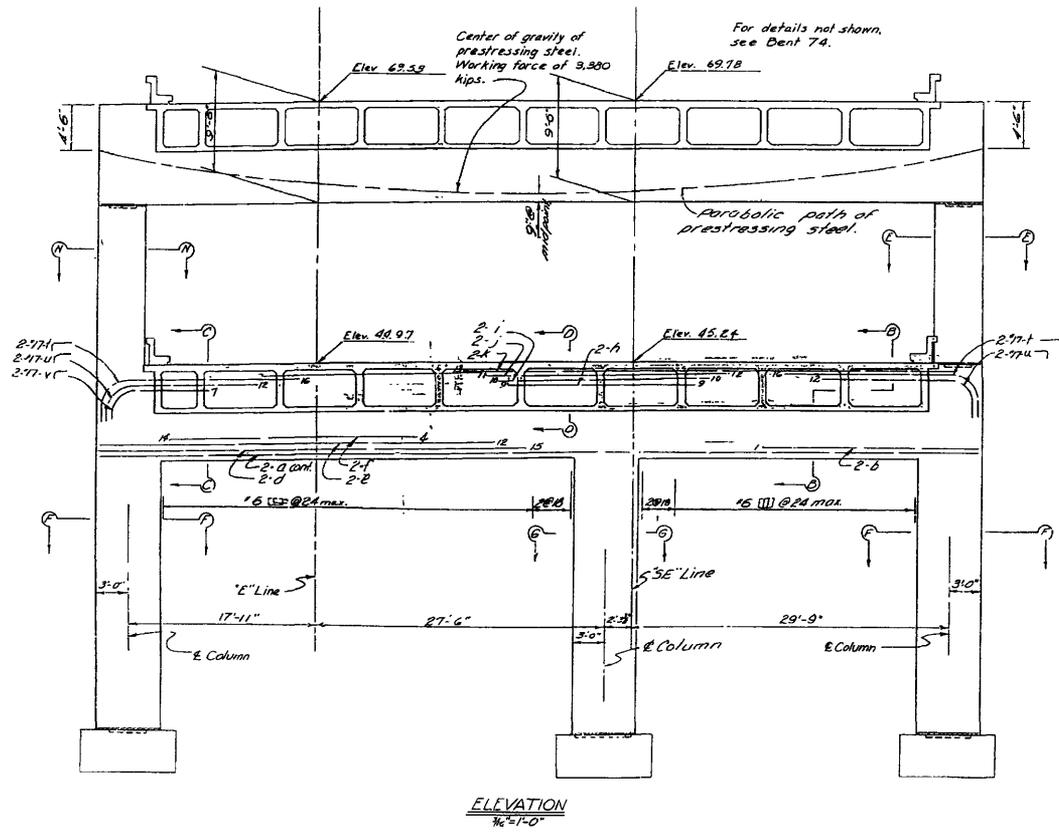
Elevation drawing of Bent 77 at Embarcadero Viaduct.
